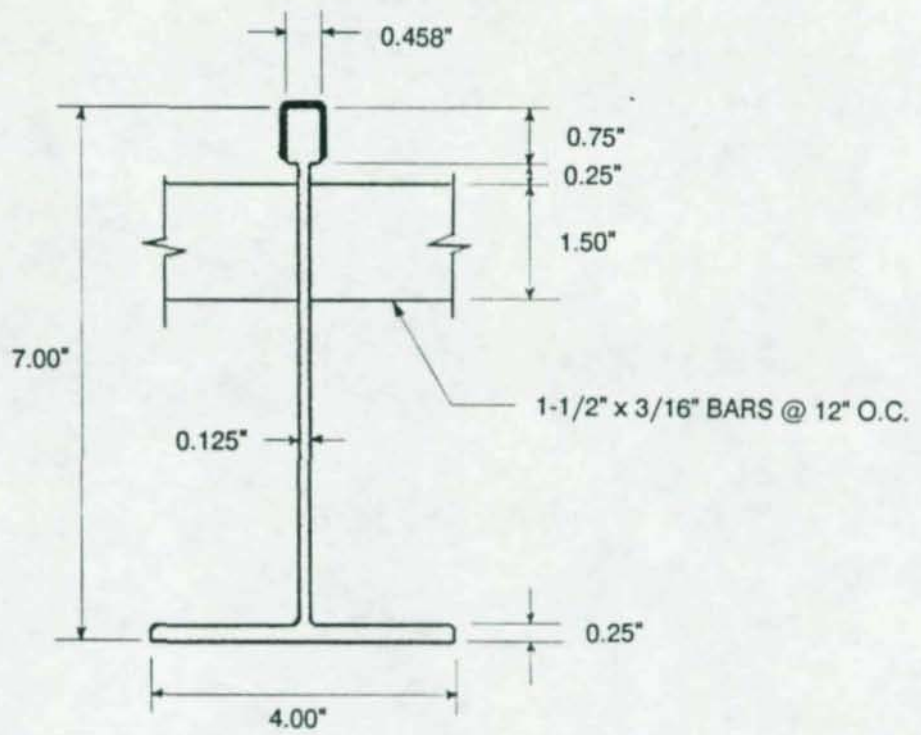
Proposed Cross Section for Long-Span Steel Grid
